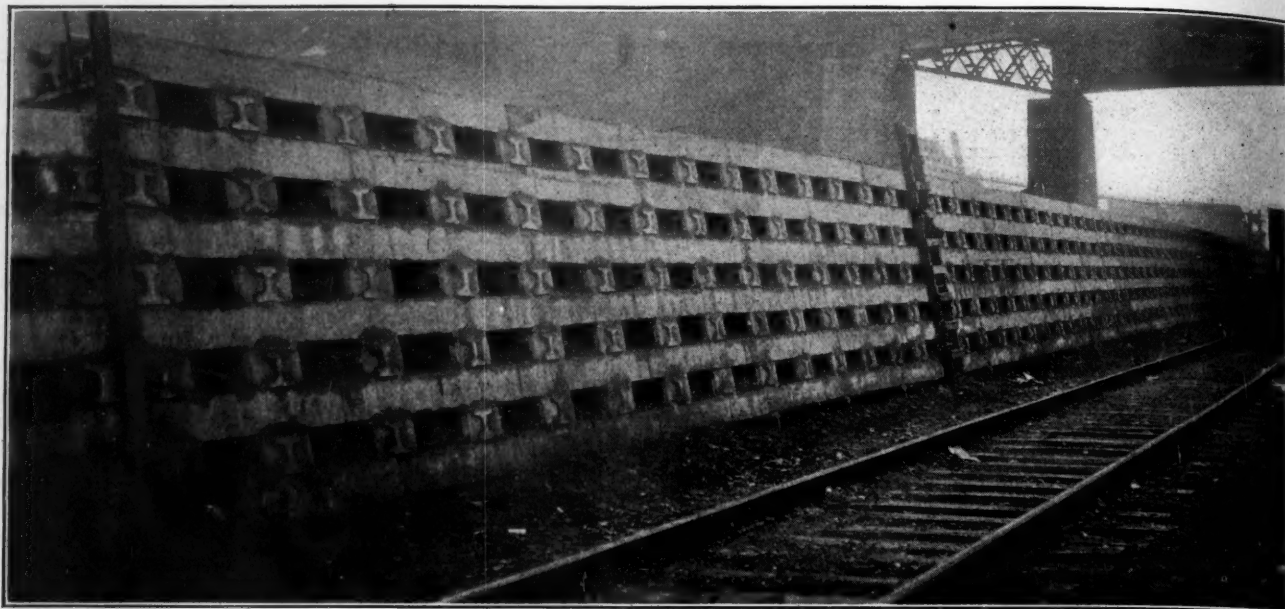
SECTIONAL CONCRETE RETAINING WALL IN PERMANENT FORM
